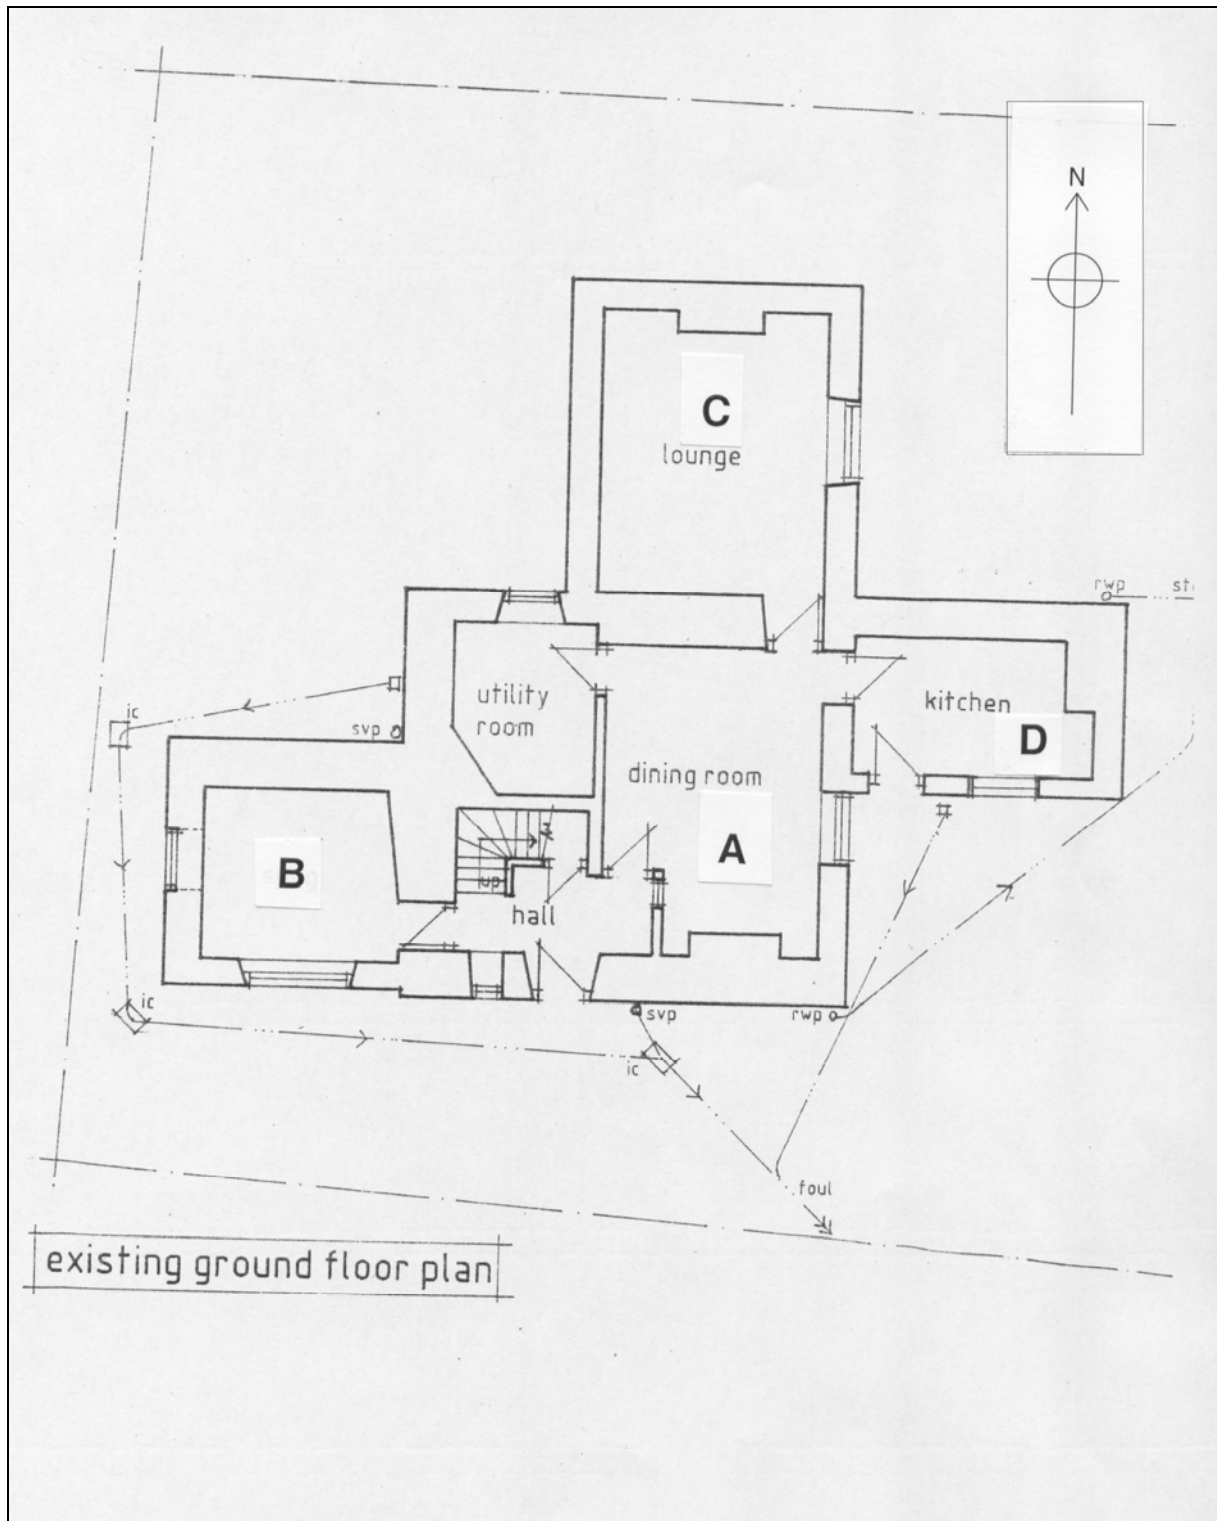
Existing Ground Floor Plan. Extract from Building Plan Services drawing HP3253/a/1 (not to scale).
